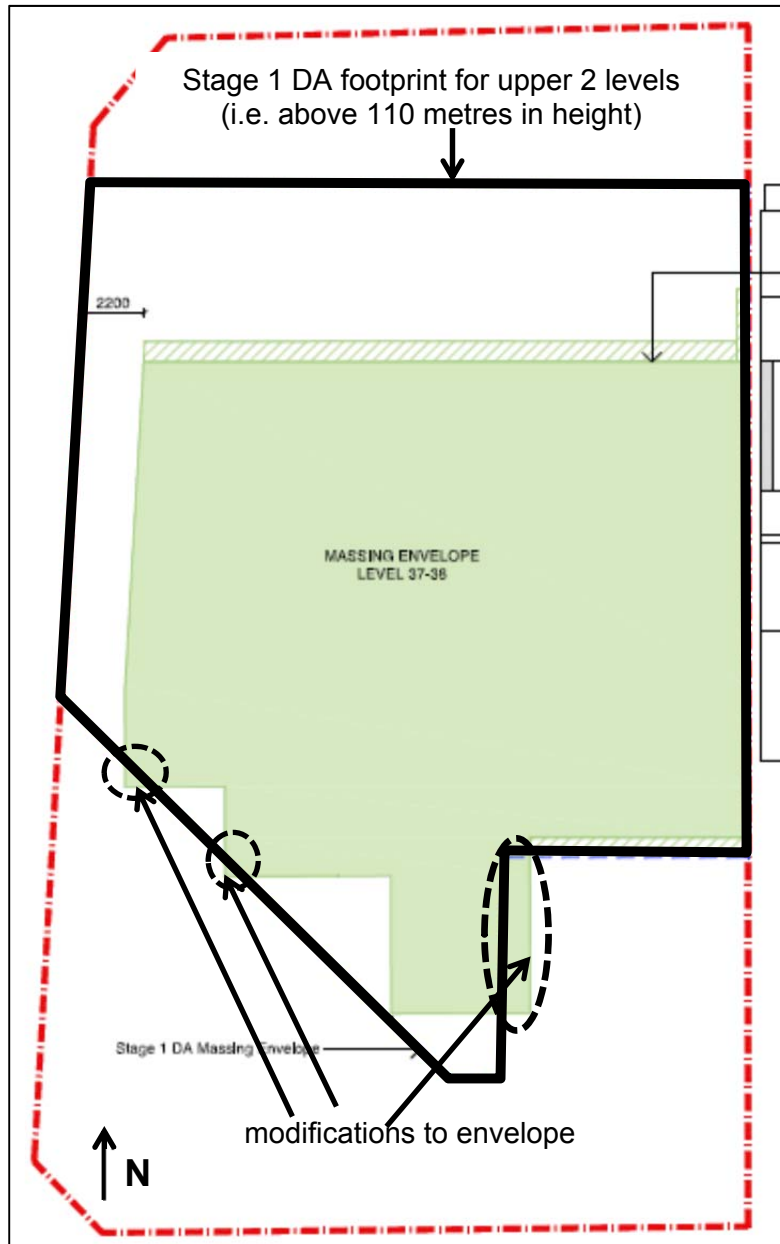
The variations proposed to the Stage 1 building footprint on Levels 37 and 38
